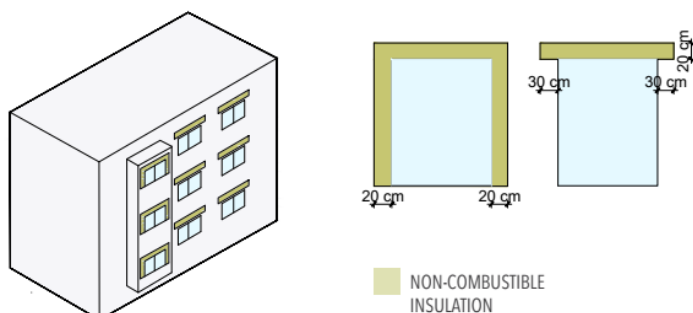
Fire barriers around the openings - fire spread prevention within the fire compartment [17].
